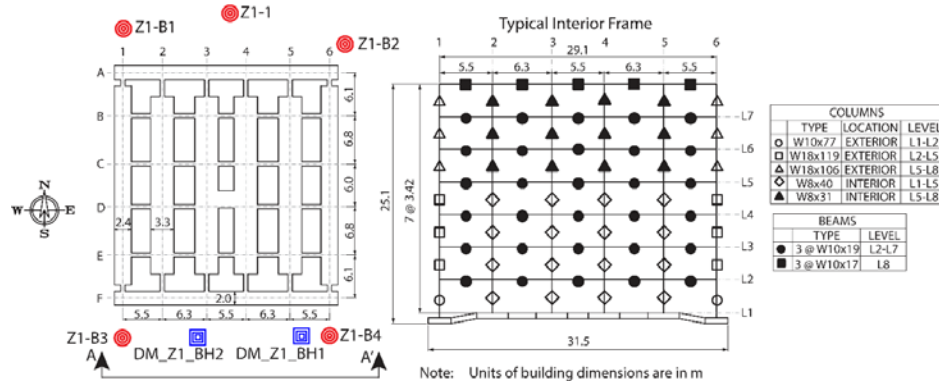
Foundation plan view of the FTG-7 building and elevation view of a typical interior frame.
